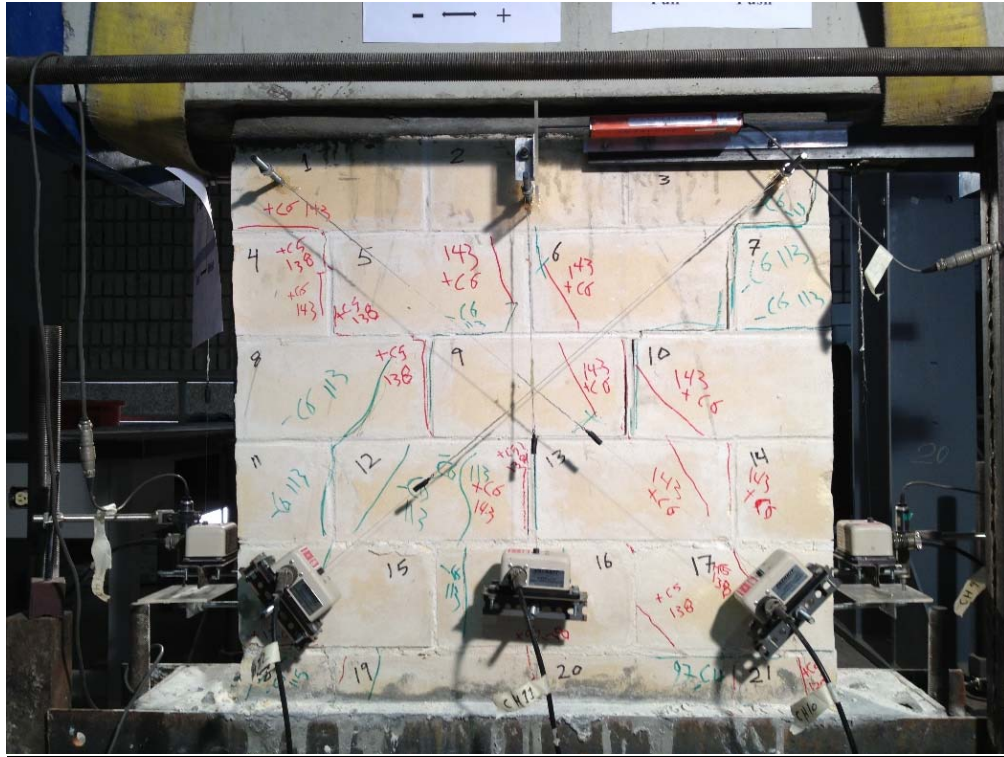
Damage associated with 9.8 mm pull loading Wall-1.7
